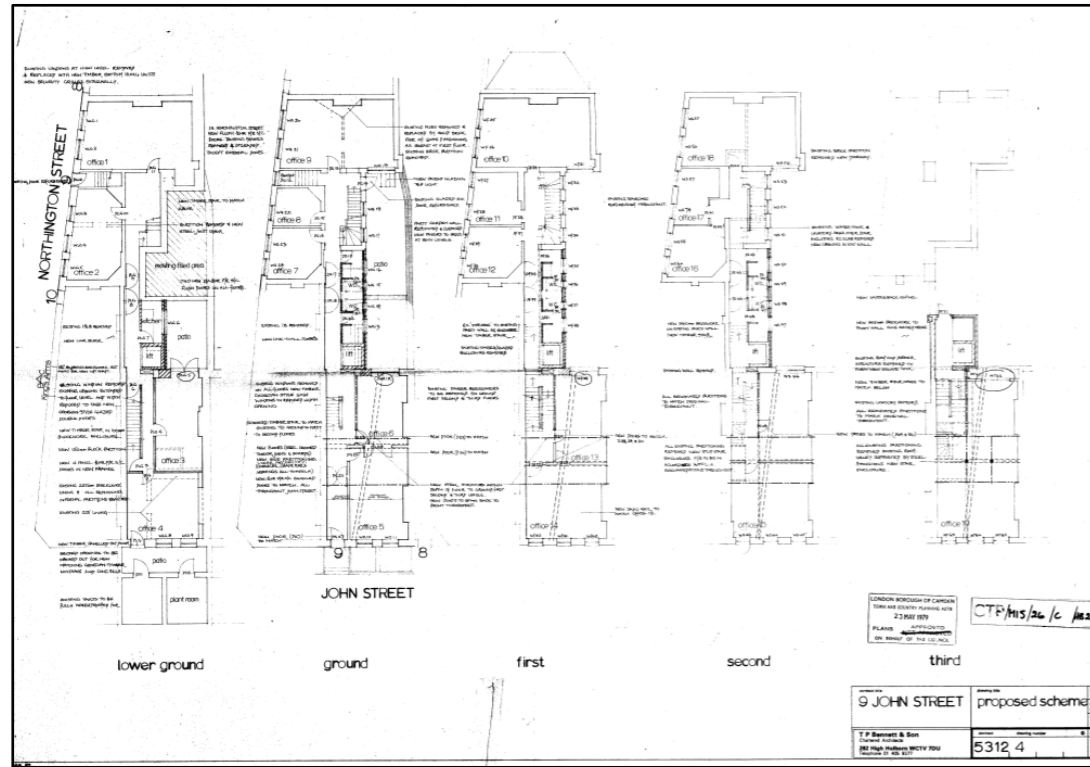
Approved plans for the buildings from 1979, showing the full rebuilding of the link block from the ground floor upwards. These plans correlate with the link block 'as built' on site. Earlier permissions from 1974 and 1975 allowed for the retention of the ground floor of the link block and extensions at 1<sup>st</sup> and 2<sup>nd</sup> floor level.
